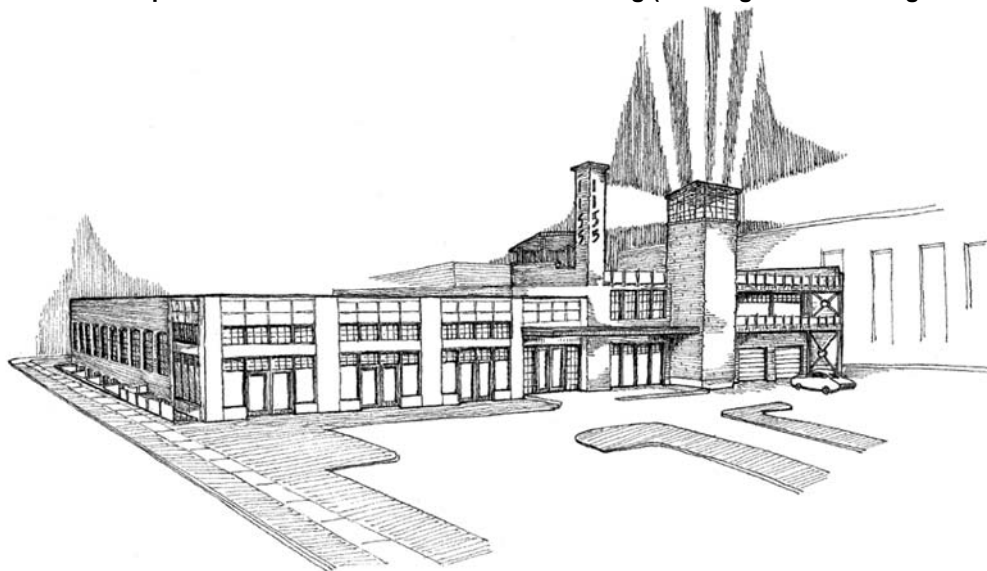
Conceptual Illustration of the Front of the Building (Looking South on Dundas Street)
